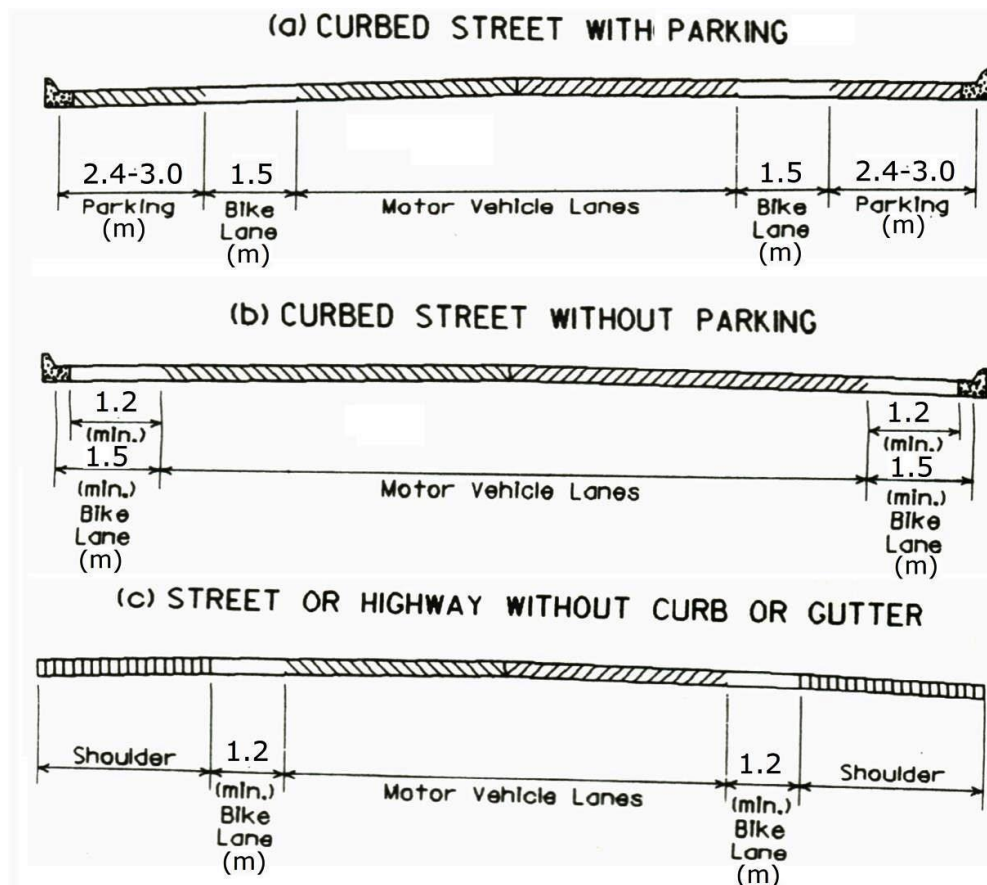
/1: Typical Bicycle Lane Cross Section [3, p.202]
